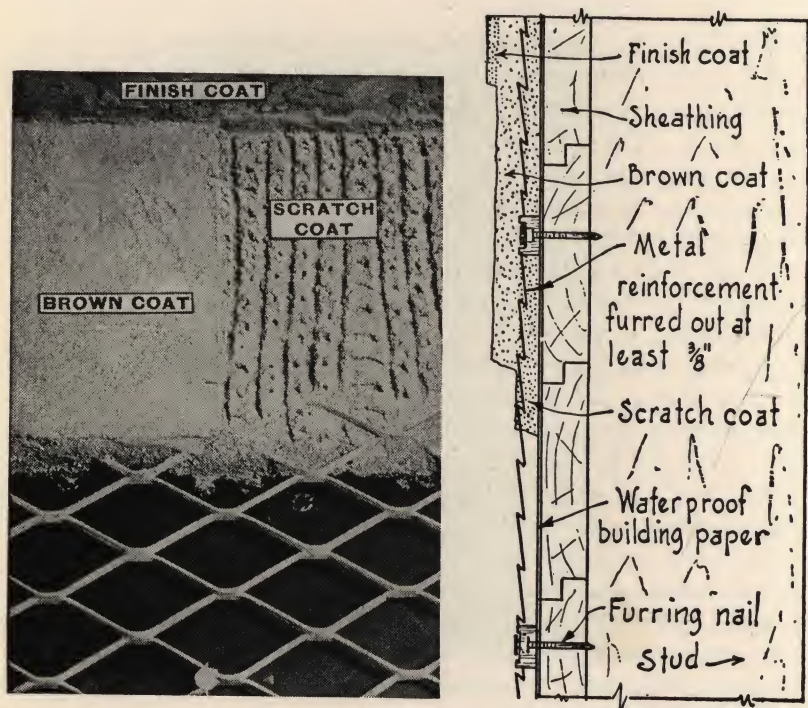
Showing proper construction for stucco on metal reinforcement. Note the backing of waterproof building paper, the metal reinforcement held at least $\frac{3}{8}$ in. away from the backing with furring nails, and the scratch coat filled in solidly behind the metal.
